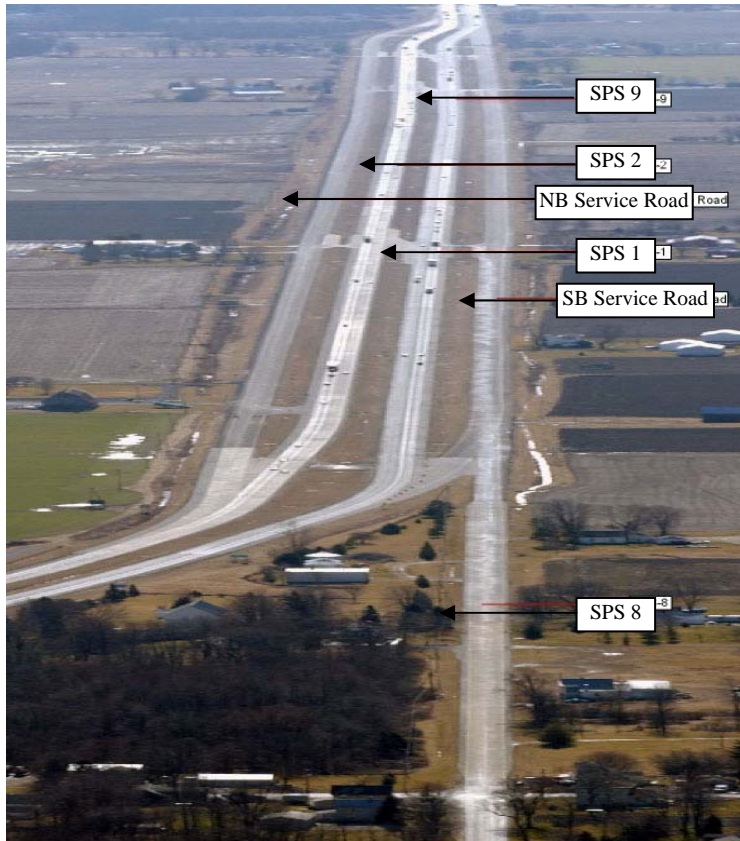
Layout of Ohio SHRP Test Road (Sargand, 1994).
